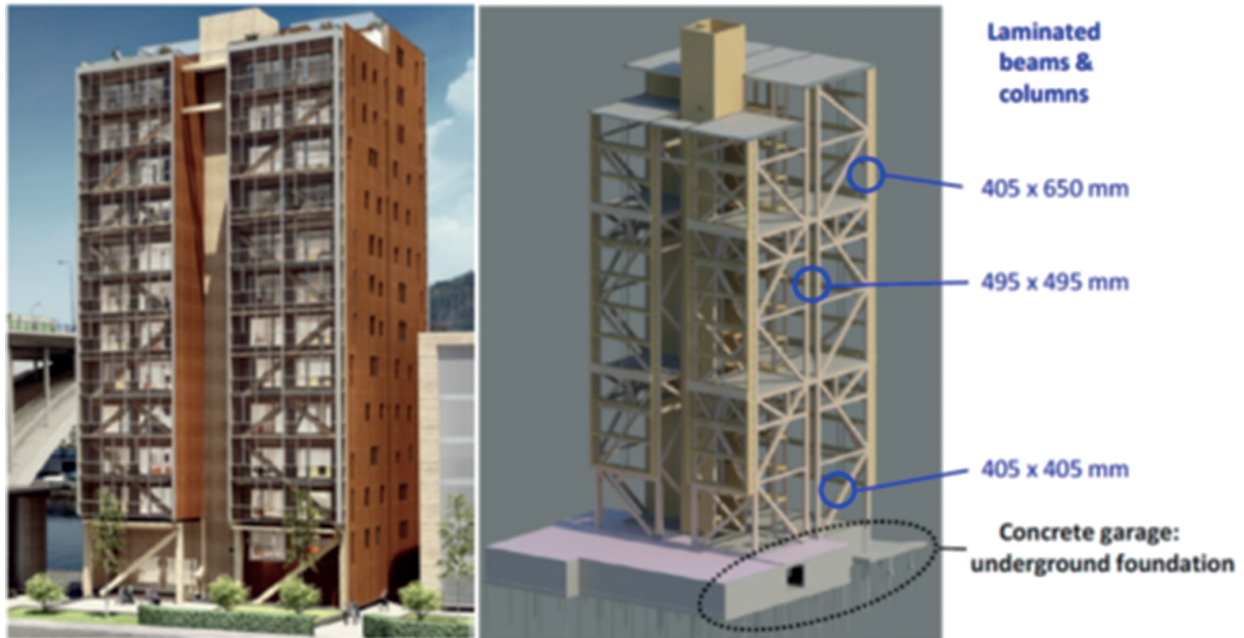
a) 3-dimensional view of the completed “Treet” building: a 45-meter high building with laminated (Glulam) load-bearing structure, and b) details of Glulam-based building structure [adopted from [12]]
